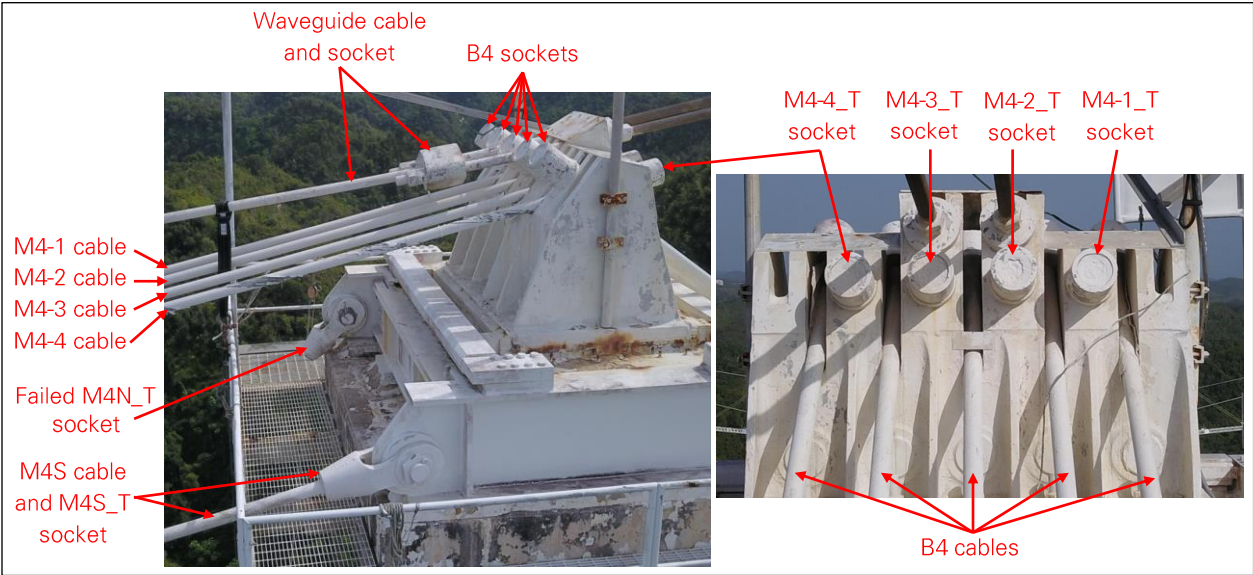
Cables and sockets at top of Tower 4 after M4N failure, looking northeast (left) and northwest (right) (photos: NAIC Arecibo Observatory, a facility of the NSF).
